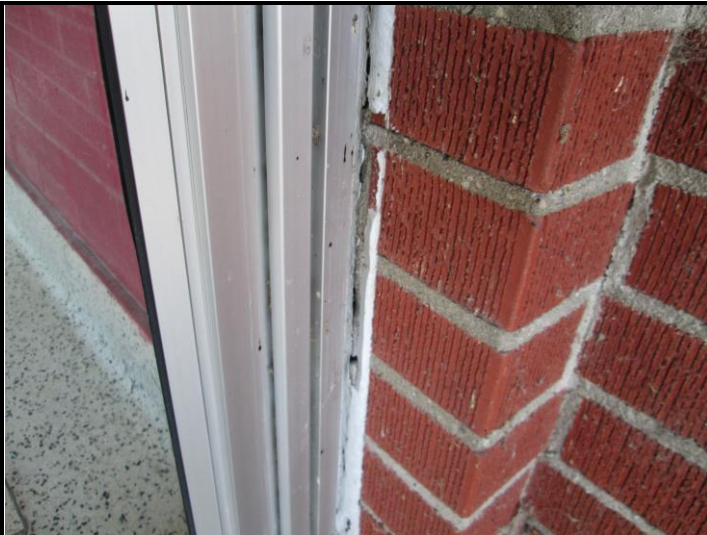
White Door Caulking (samples 21A-C) was sampled from the exterior of the building was found to contain 1.3% Chrysotile asbestos.
